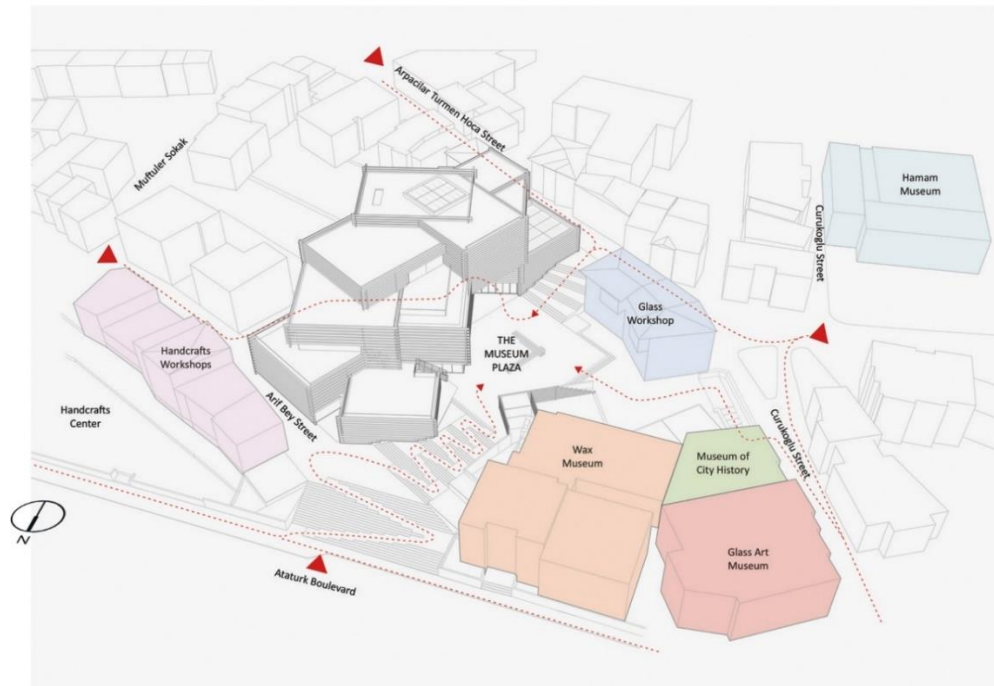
Site Plan of OMM (Recomposed the images from www.archdaily.com.)
